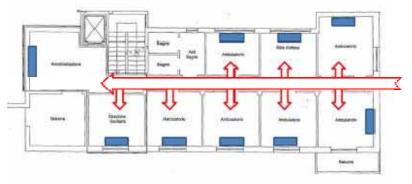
First and ground floor : Plan and Air-Conditioning system
